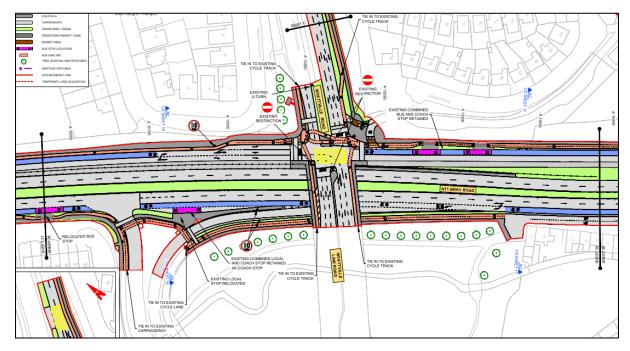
Extract from General Arrangement Drawings (Sheet 38)
